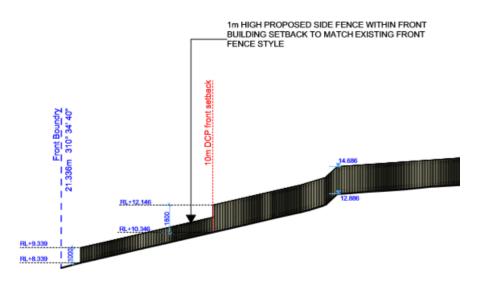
Proposed timber lap and cap fence elevation for the southern side boundary
